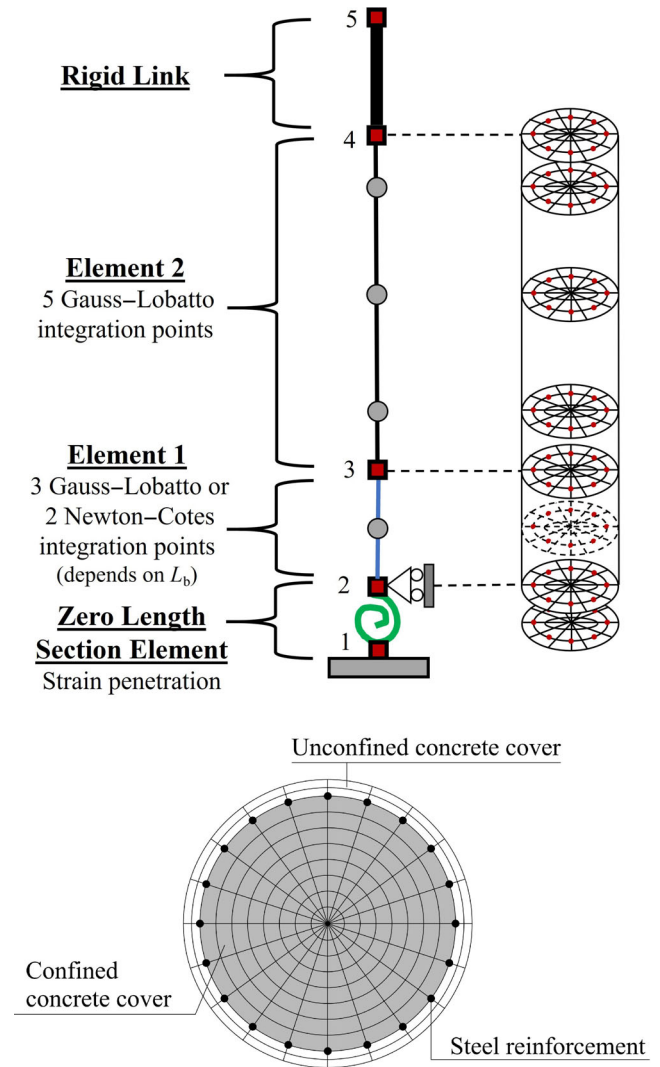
Structural FE model of the RC bridge column (up) and detail of the cross-section discretization (down)
